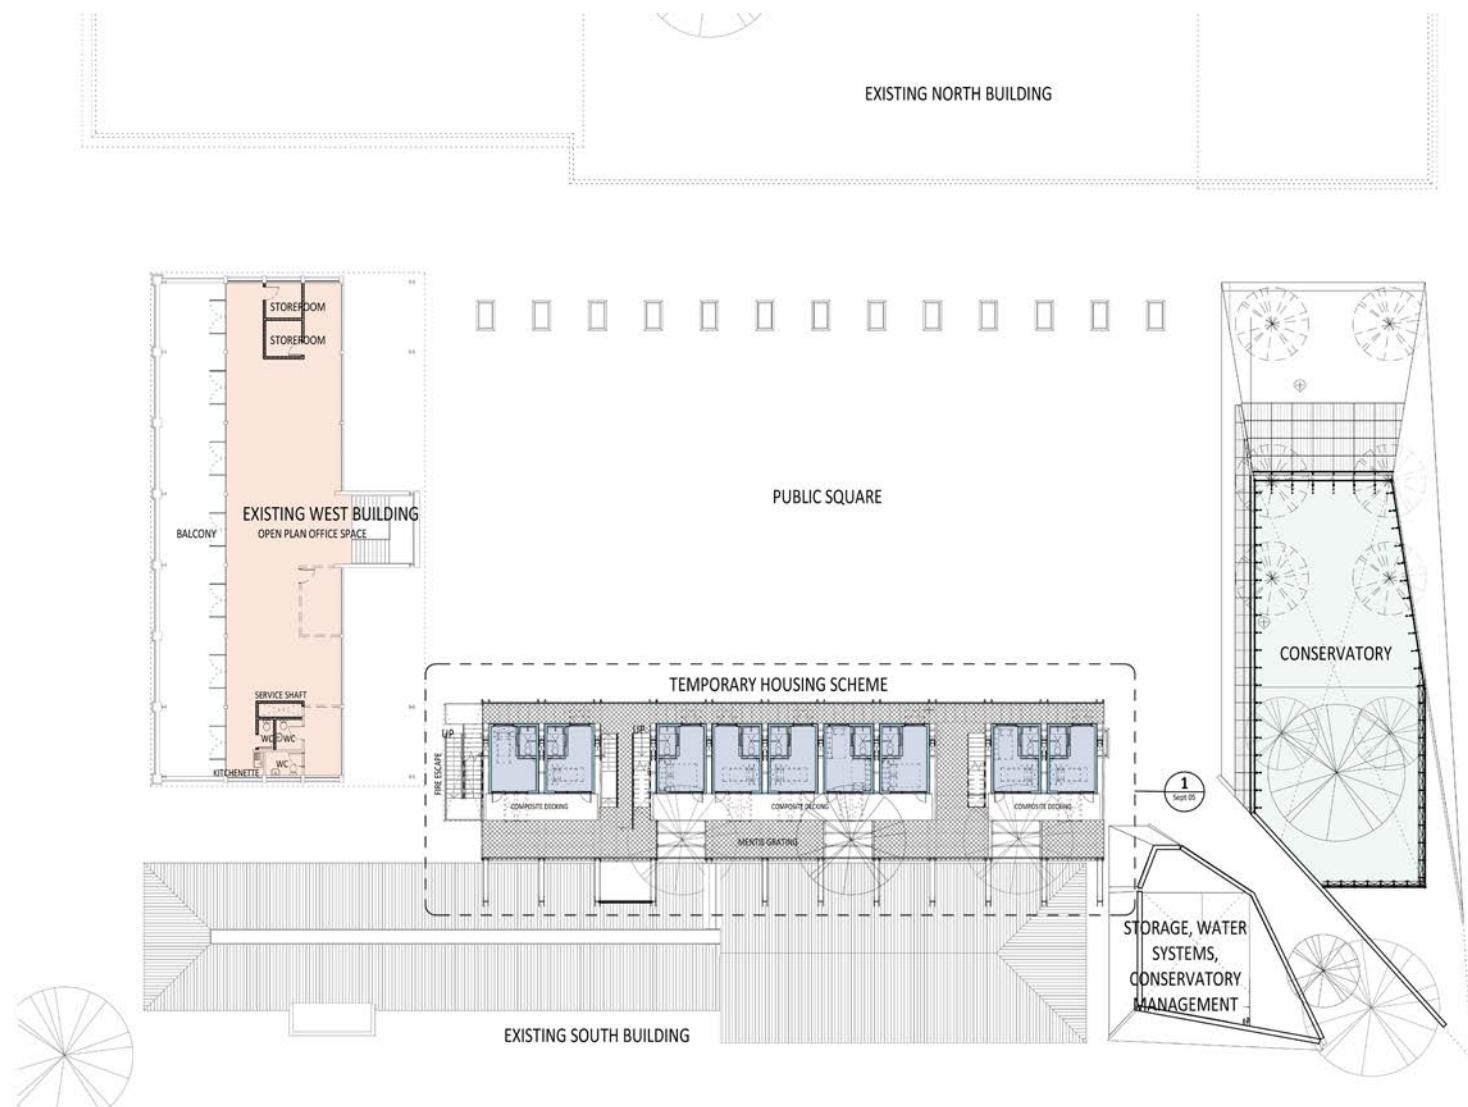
First Floor Plan illustrating programmatic allocation
